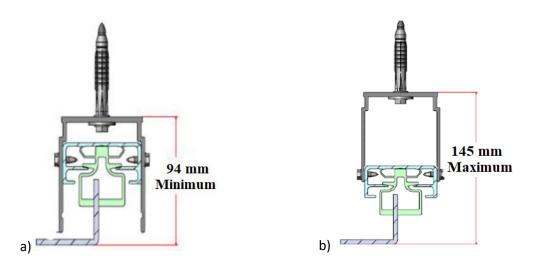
Tested configurations for the assessment of the connection between vertical profile and brackets: a) minimum spacing; b) maximum spacing.
